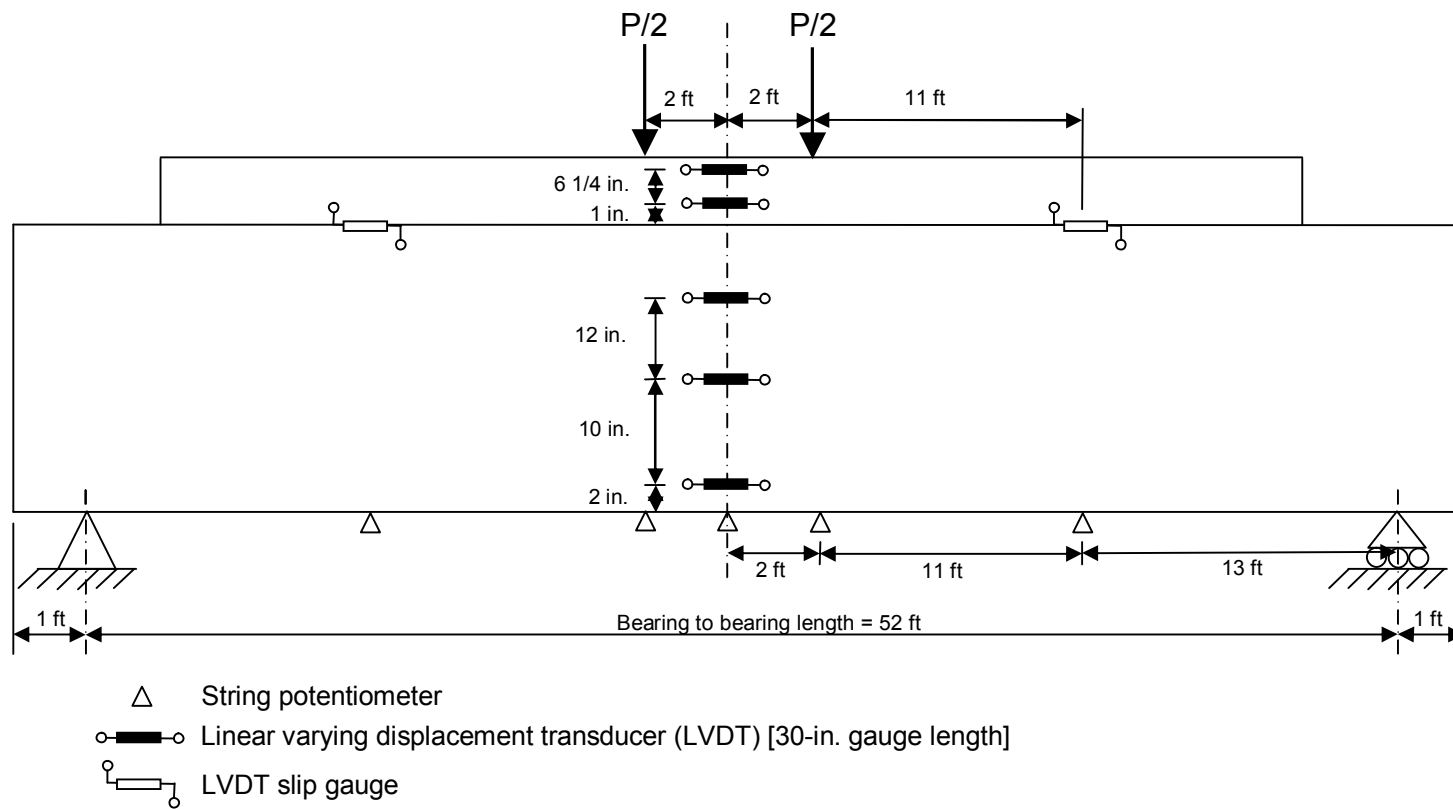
Elevation view of external instrumentation for flexure testing of Girder 1. (All instrumentation except string potentiometers is mirrored on other side of beam.)
